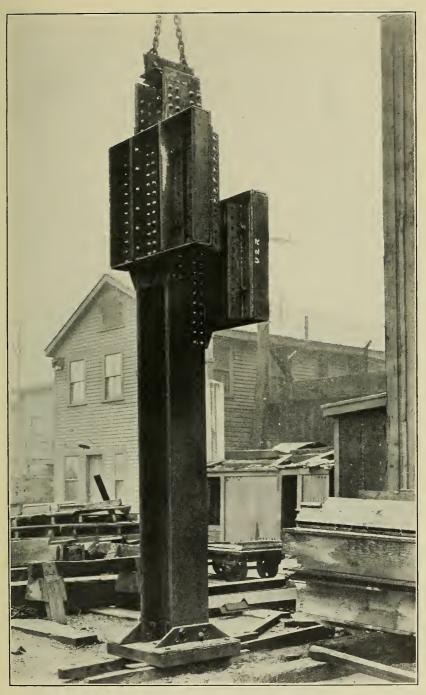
PLATE X.—TYPICAL COLUMN DESIGNED FOR HEAVY ECCENTRIC LOADING AT PARK STREET STATION.
